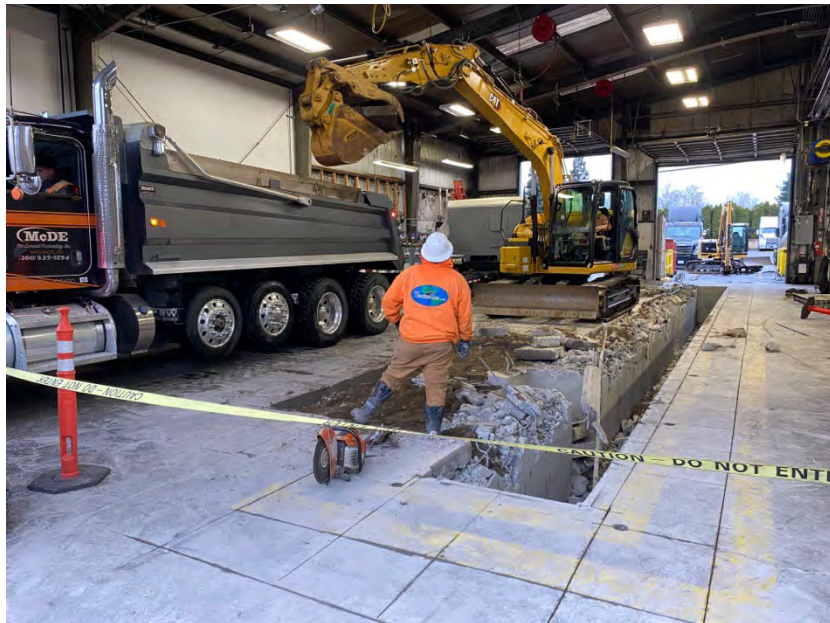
View east of the initial removal of concrete floor around the mechanic pit in the center bay of the truck shop.
